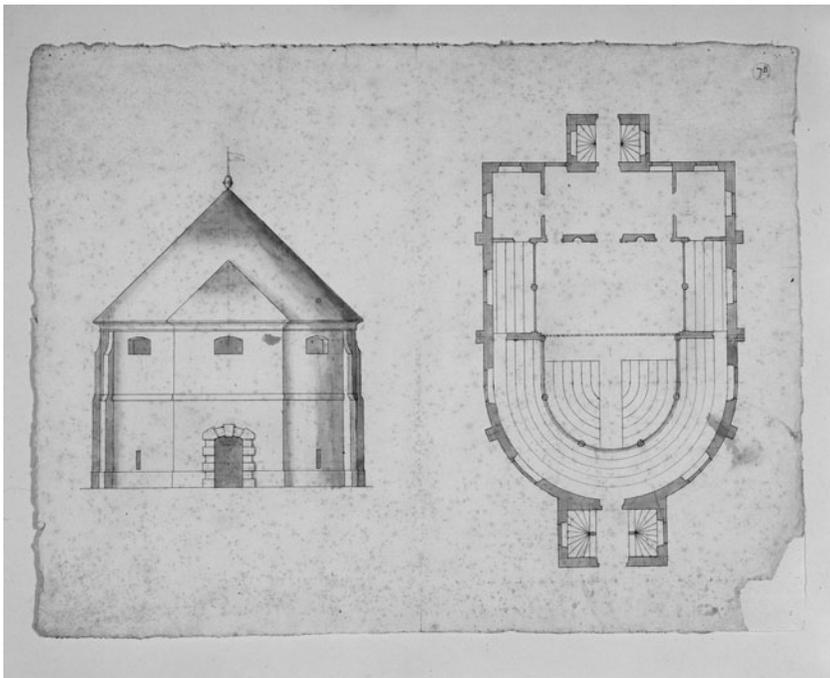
Inigo Jones/John Webb drawings: elevation and plan for an indoor playhouse.
